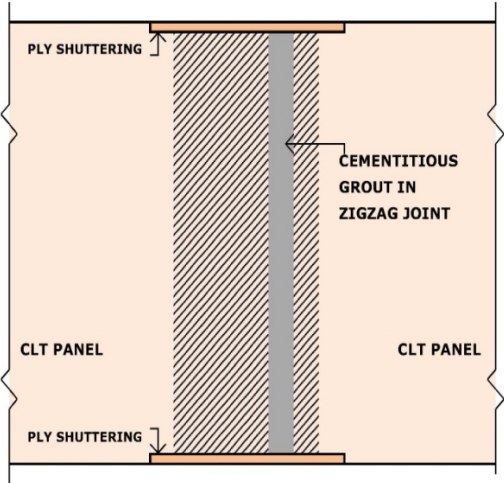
Section (X-X) of zigzag joint for external walls of the central core
